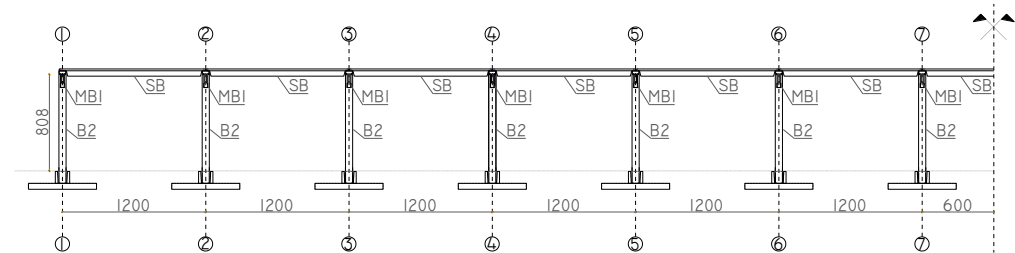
Longitudinal cross-section of the industrial hall prototype structure.
